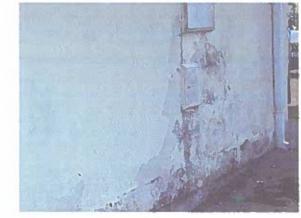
Floors to be removed, insulated and Figure 12: Cracks to be filled and dwelling painted
